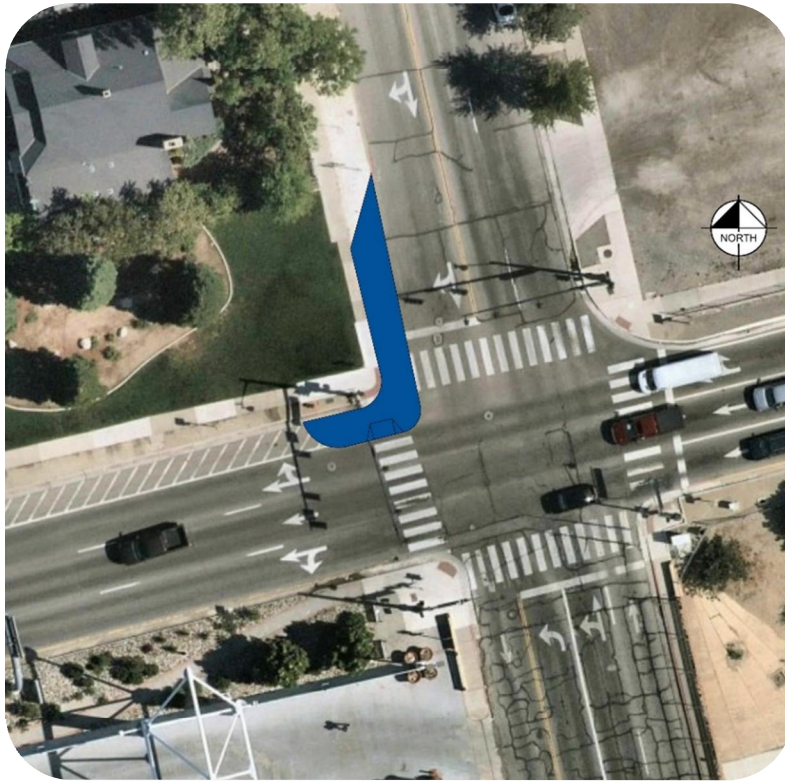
Center Street and 8<sup>th</sup> Street Conceptual Layout
